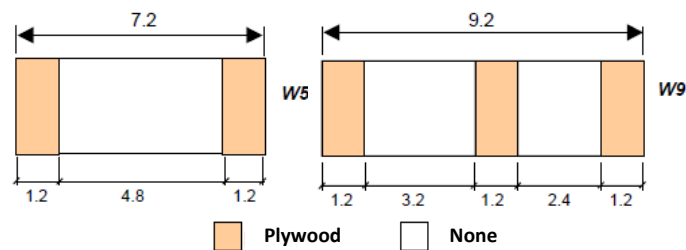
Plywood Sheathing on Exterior of Walls 5 and 9 (Paevere et al. 2003)
